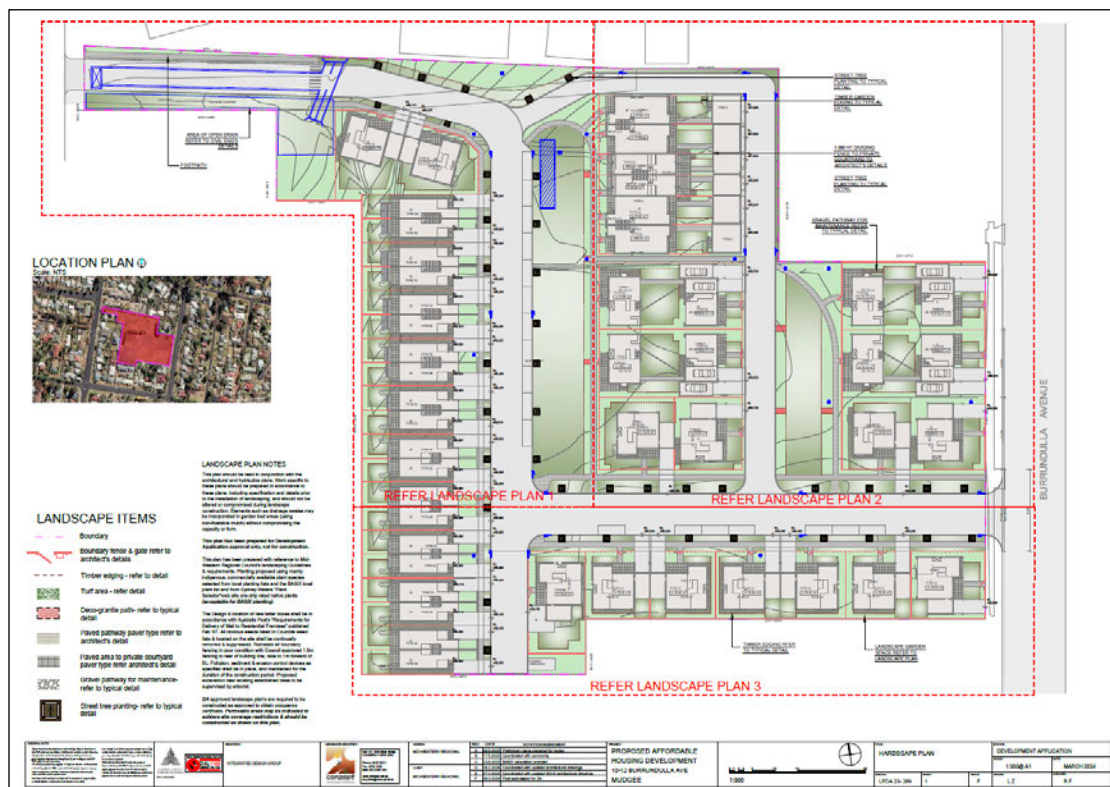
Landscape Plans – Site Plan (source: Conzept Landscape Architects)
